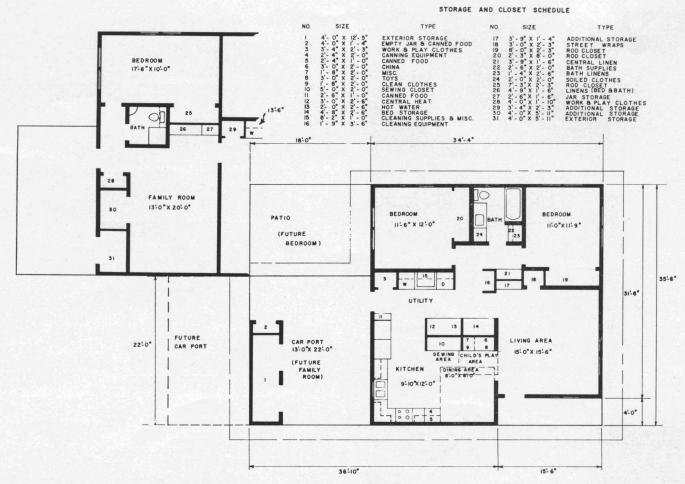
A floor layout developed from the block layout. This house may be expanded later, using the additions suggested in the upper left hand corner of this illustration.
